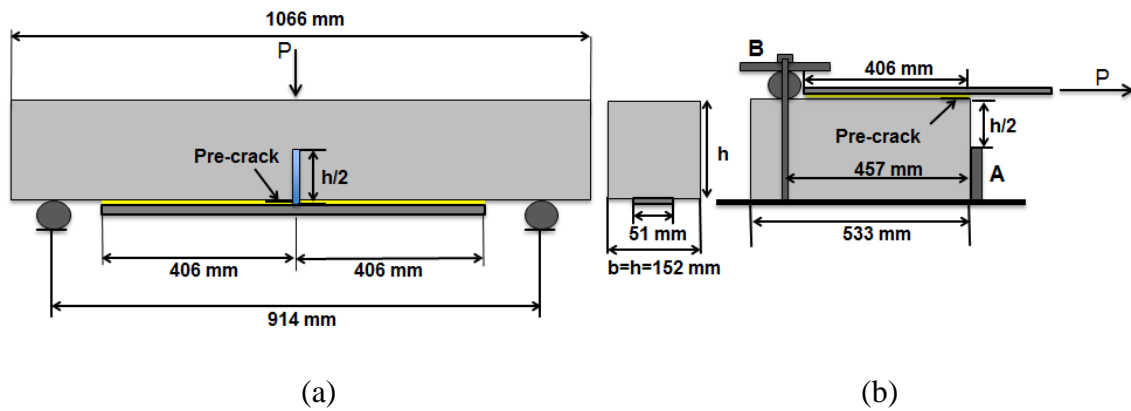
Experimental specimens: (a) beam specimens, (b) pullout specimens
